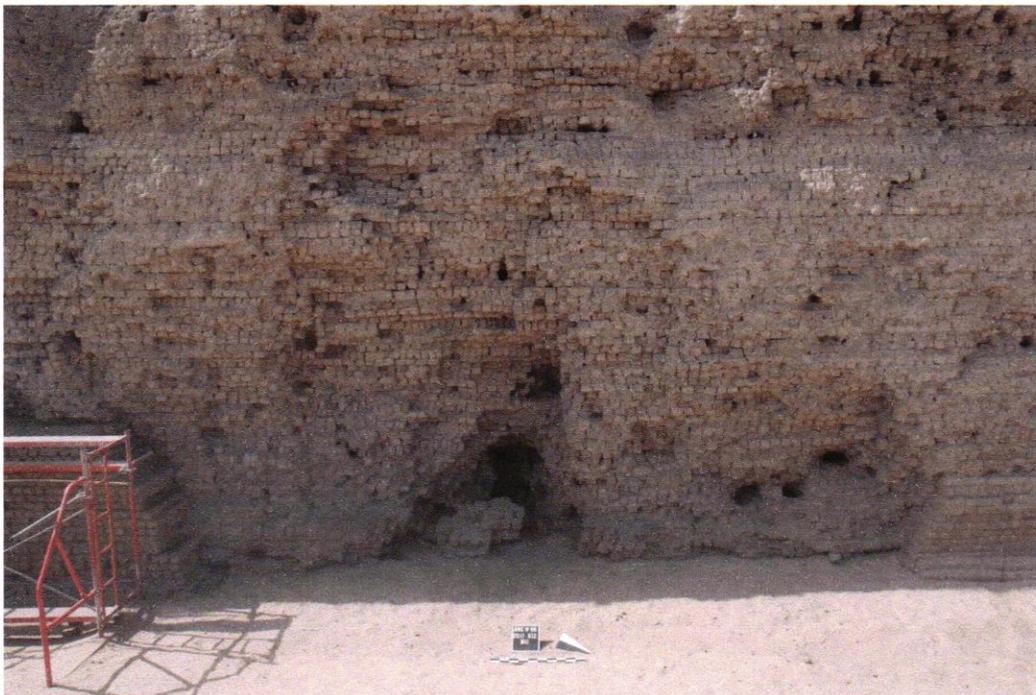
A typical area of undercutting, overhanging masonry, and animal burrowing along the interior side of the southwest wall of the main enclosure. This photograph shows the section of wall just to the right (northwest) of that shown in Figure 51.
